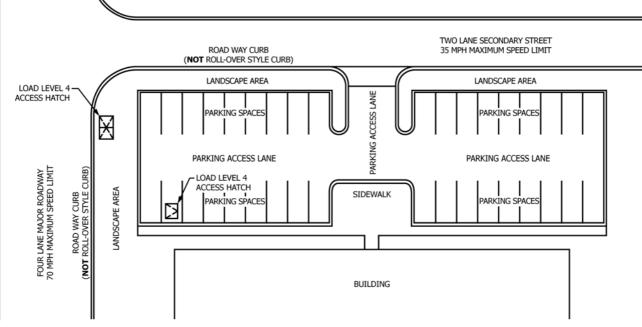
Plan Showing Appropriate Locations for Load Level 4 Access Hatches—Occasional Truck Traffic
